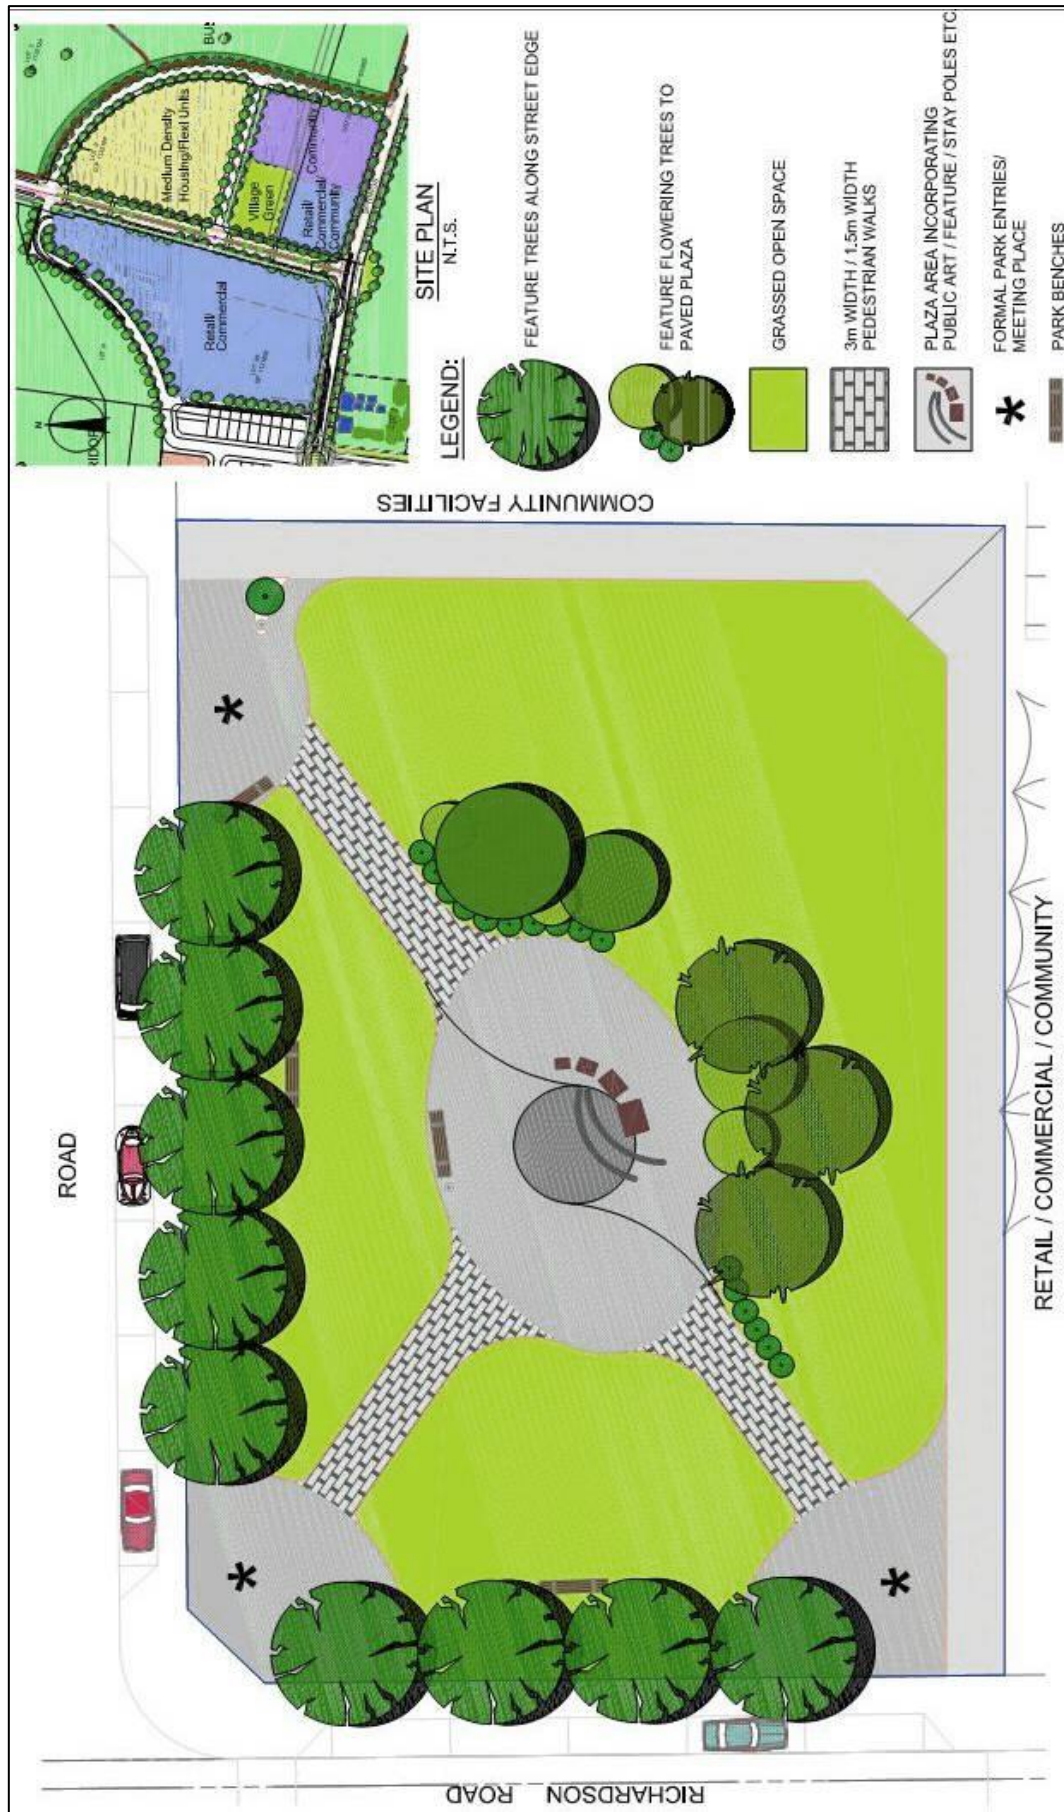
Spring Farm Neighbourhood Centre Village Green Concept Plan
